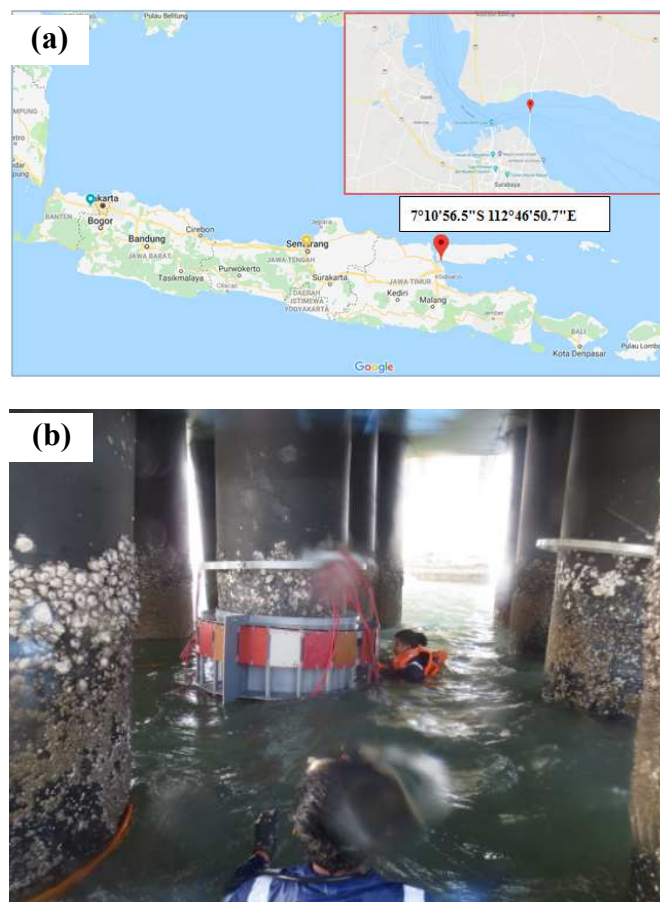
(a) Location of a field test, and (b). The installation of specimens on the pier of Suramadu bridge
